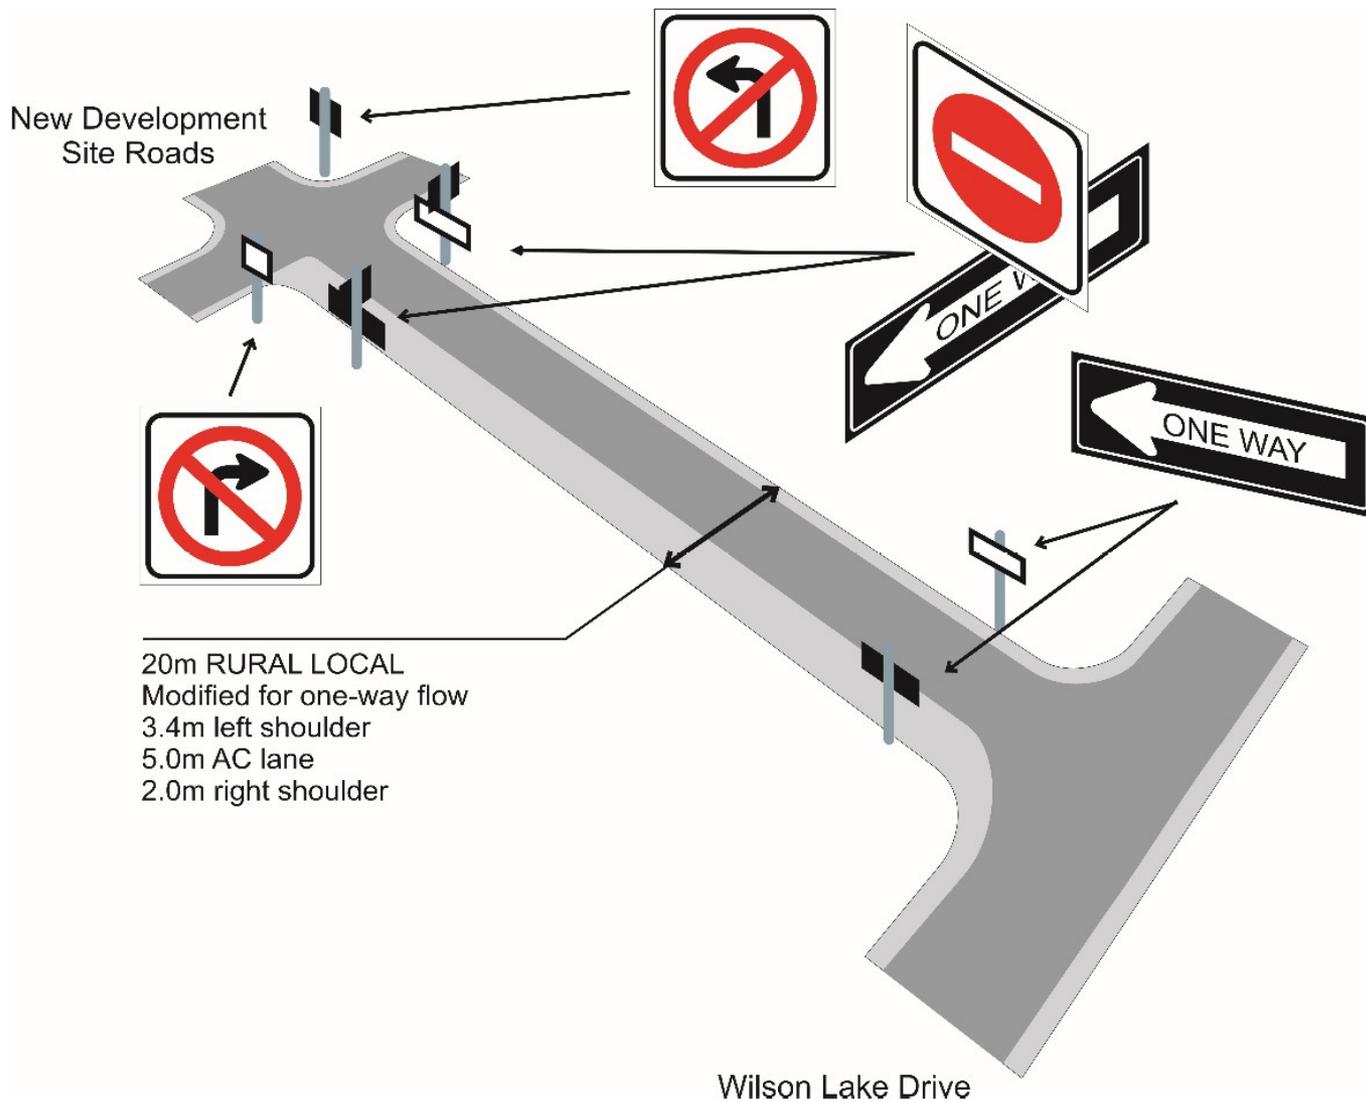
Proposed Layout of One-way Connection to Wilson Lake Drive
